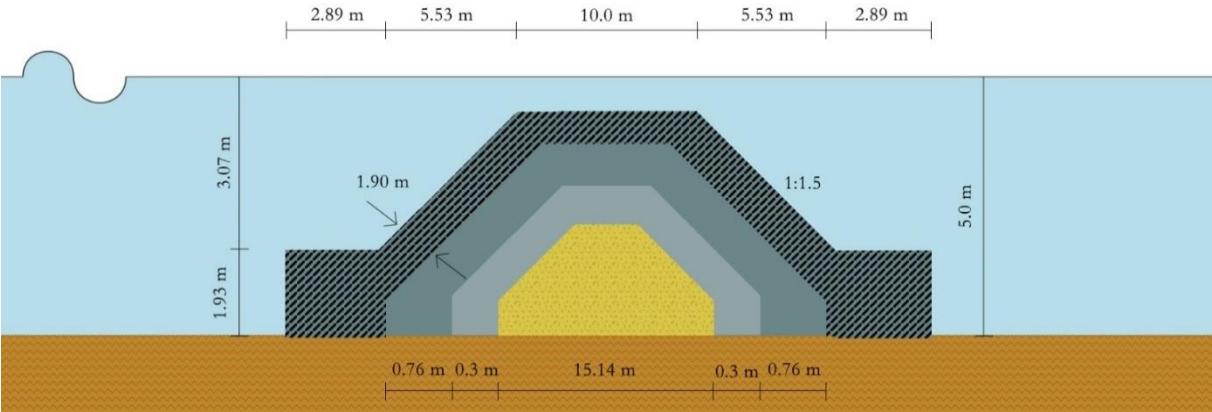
Detailed design of the submerged breakwater (not to scale)
